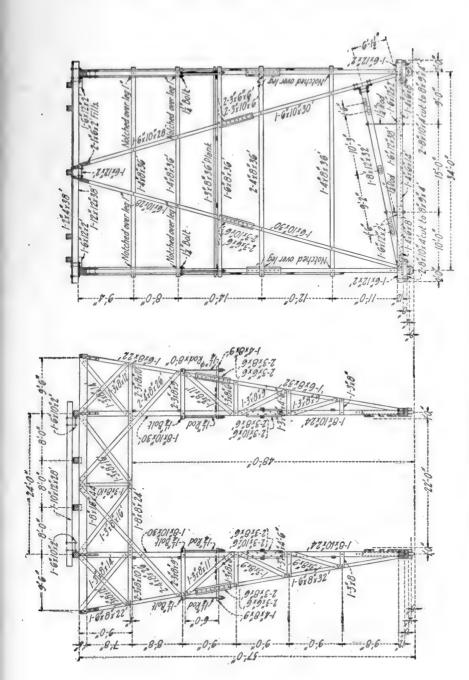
THROUGH BRIDGE TRAVELER. AMERICAN BRIDGE COMPANY. (Traveler No. 1 in Fig. 23.)
